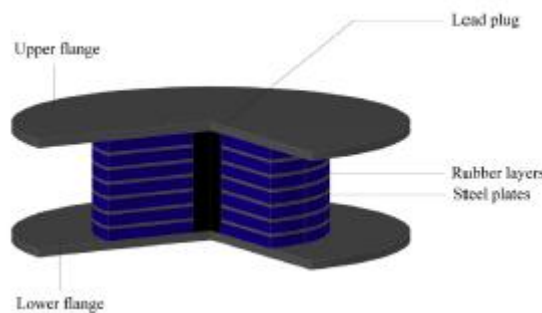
thick rubber layer bearing schema (Zhou et al., 2016)
